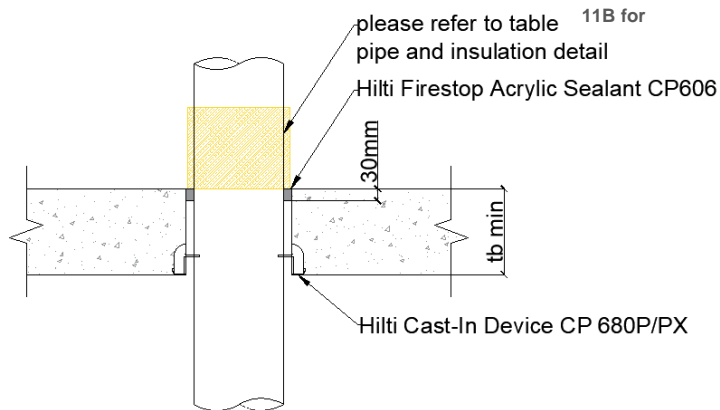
D: Section view – CP 680P/PX cast-in collar in 150 mm concrete slab detail with mineral wool insulation
